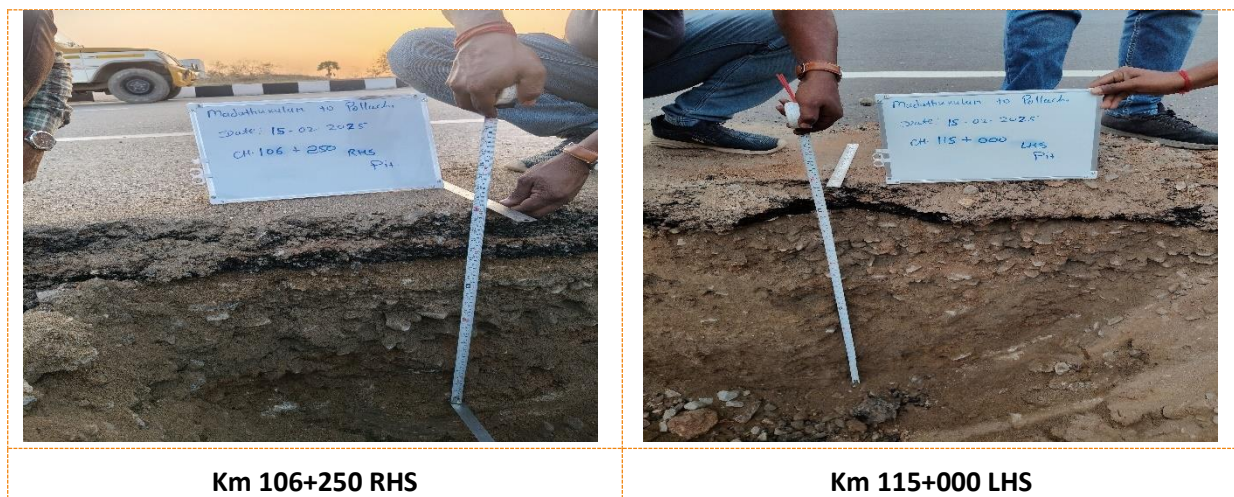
Trial pit showing pavement Layer & Soil Subgrade
